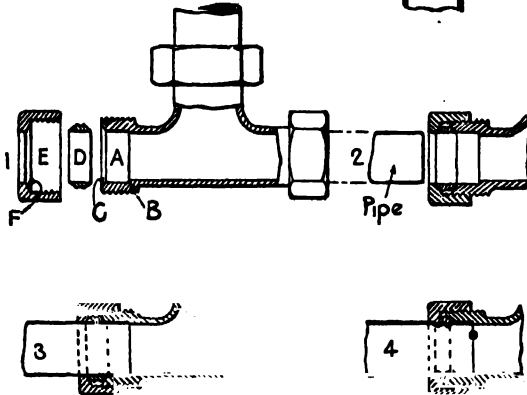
Joint having compression ring. (1) The "Instantor" Union dismantled to show: A, socket; B, distance stop; C, seating for ring; D, compression ring; E, coupling nut; F, nut shoulder. (2) Union coupling with pipe ready for entering and compression ring in place. (3) Joint assembled by inserting pipe through nut and ring to abut stop. (4) Joint completed by screwing nut $\frac{1}{2}$ to one complete turn. *Pulle, Dundee.
